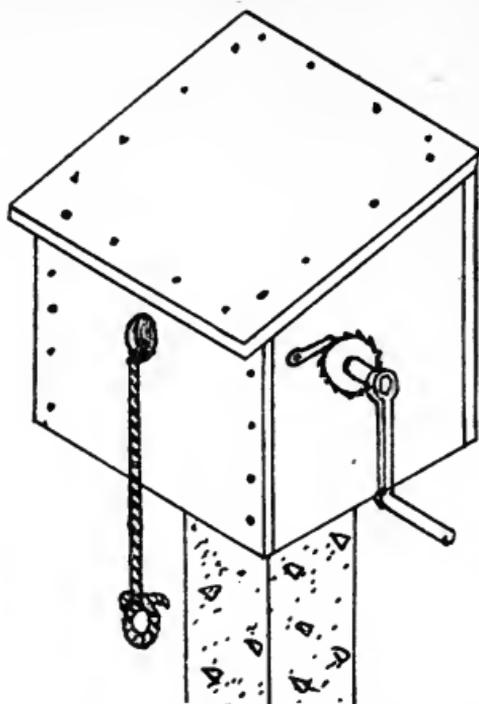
Concrete Post Supporting a Waterproof Clothes Line Reel Box
